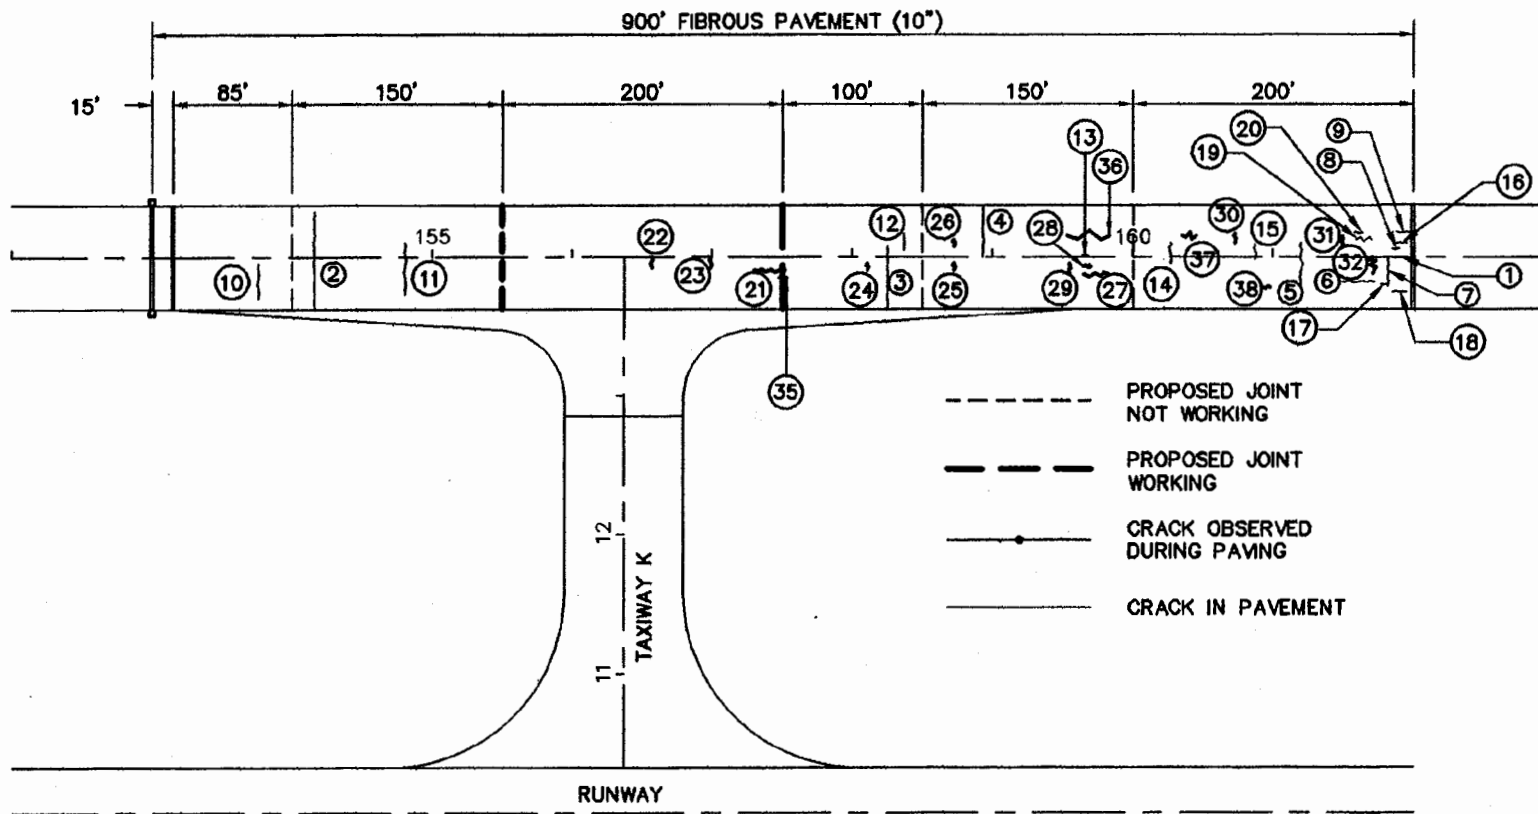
CRACKS IN FIBROUS PCC PAVEMENT, FALL 1997
